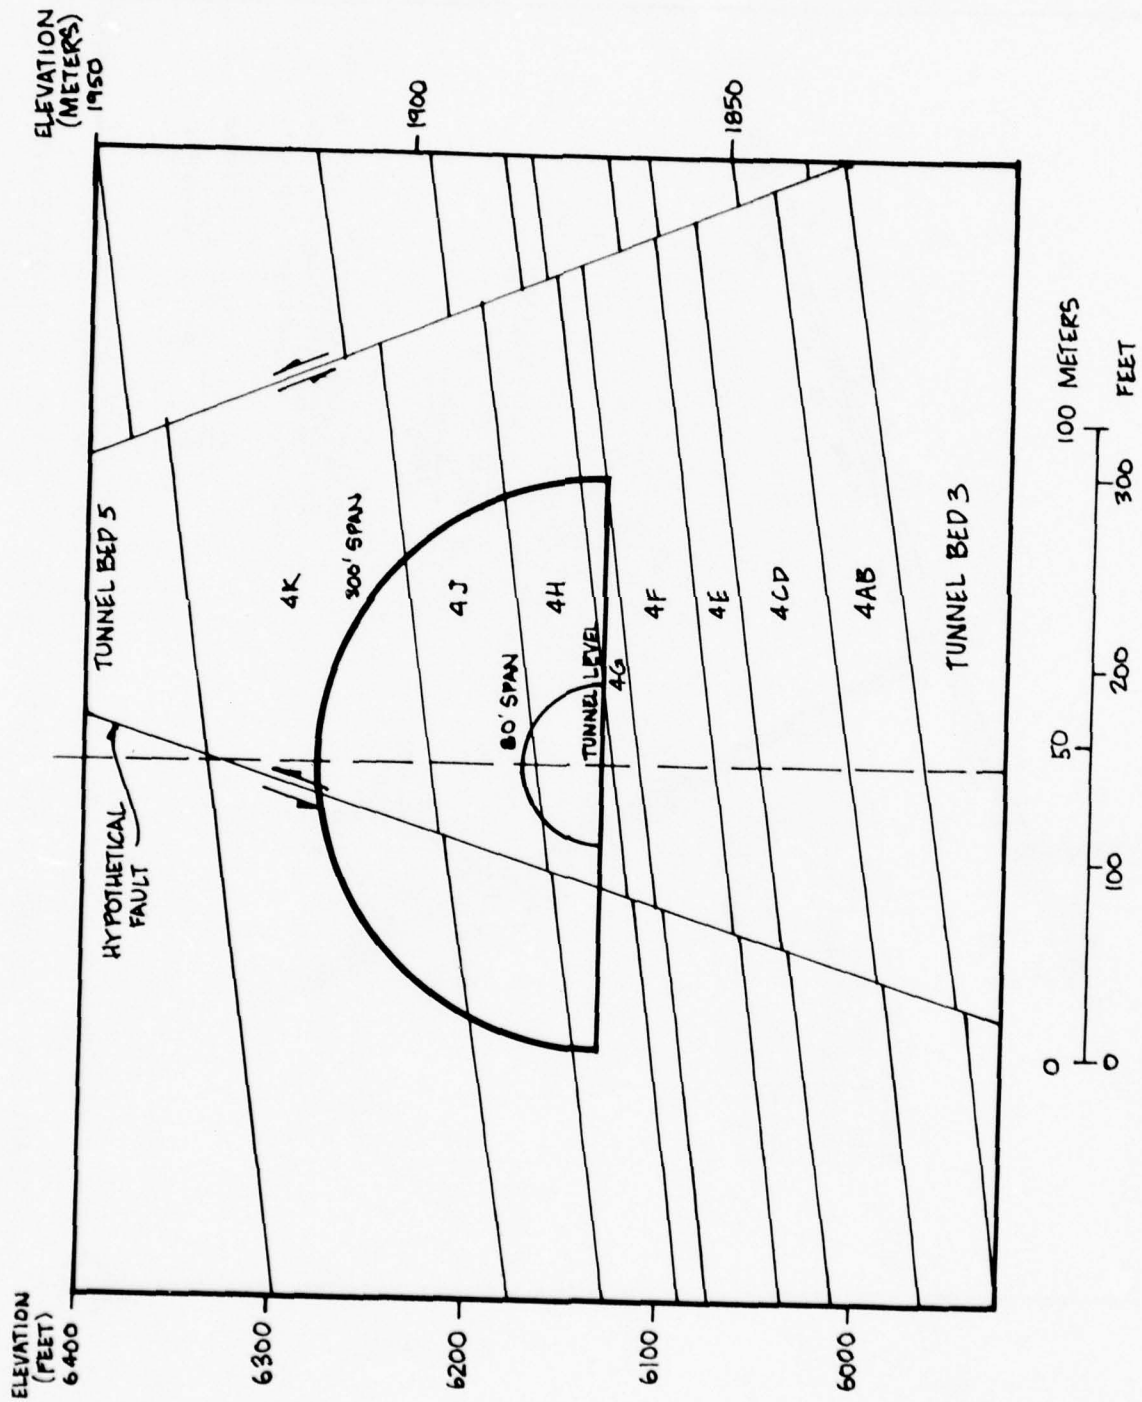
CROSS-SECTION THROUGH TYPICAL TUNNEL BED 4 SITE
